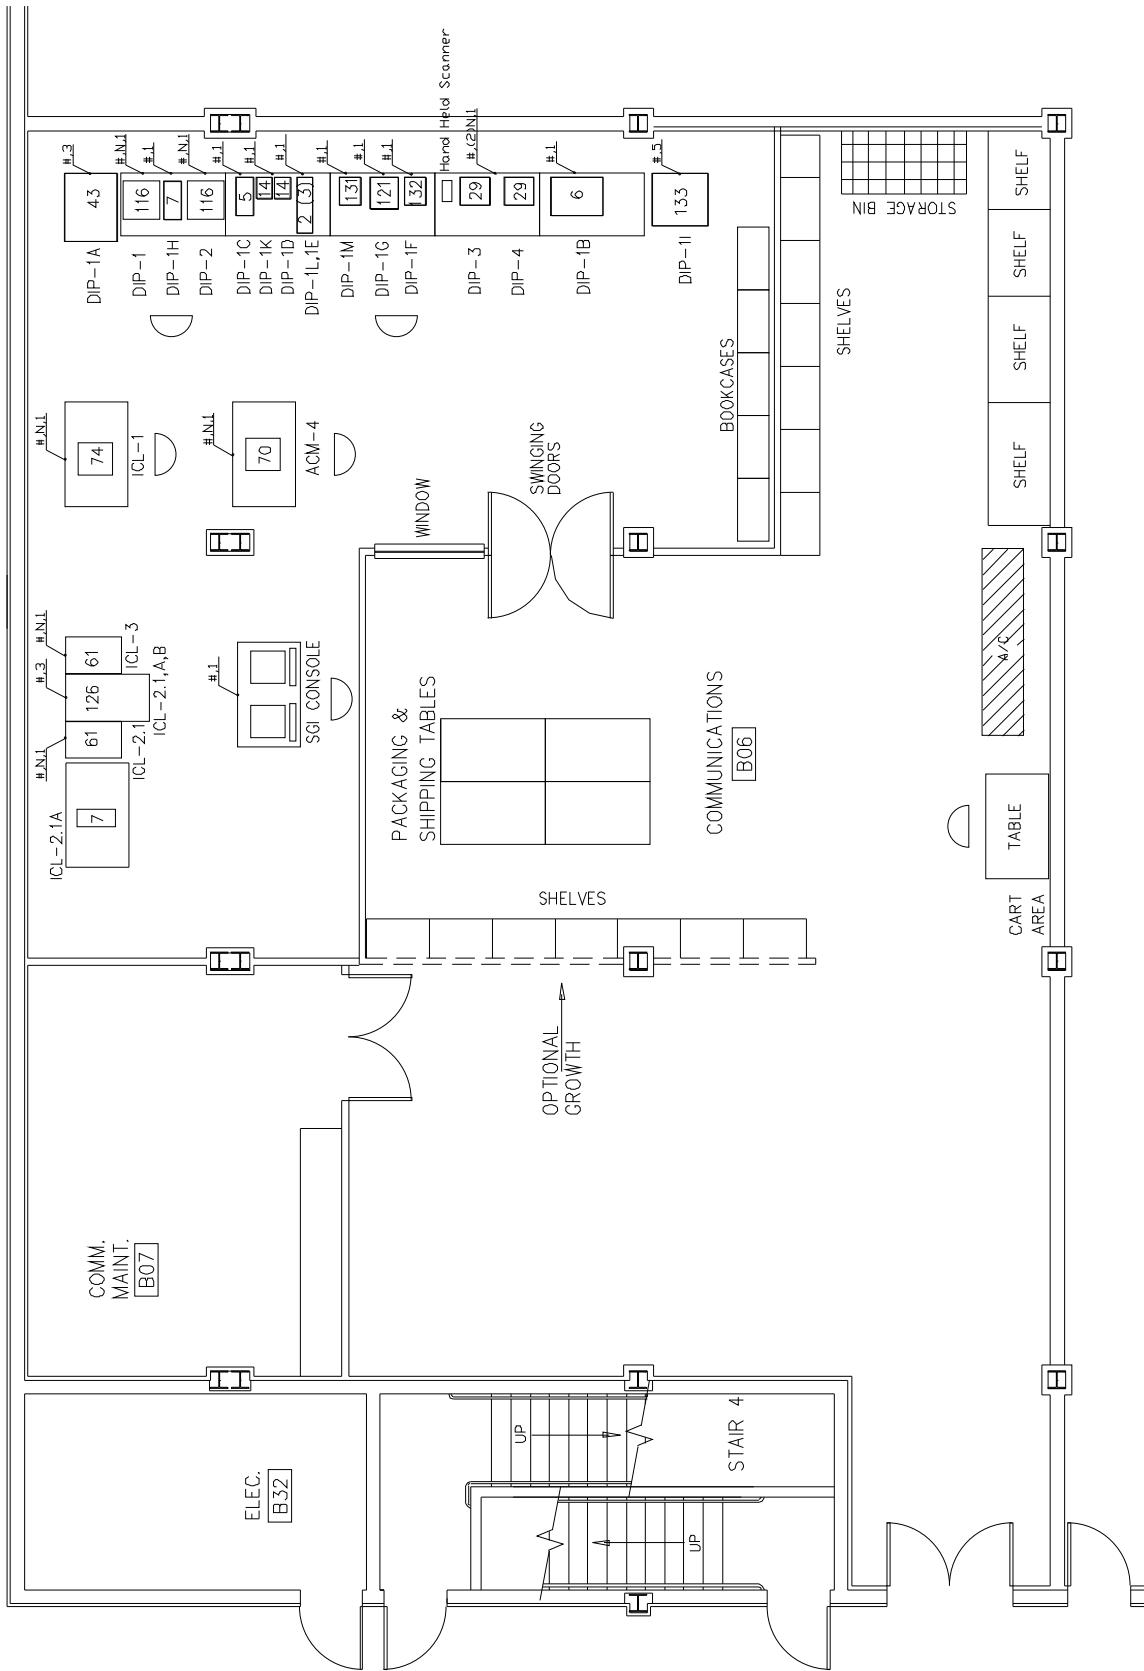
EDC Release B First Procurement Floor Plan -- Ground Floor
